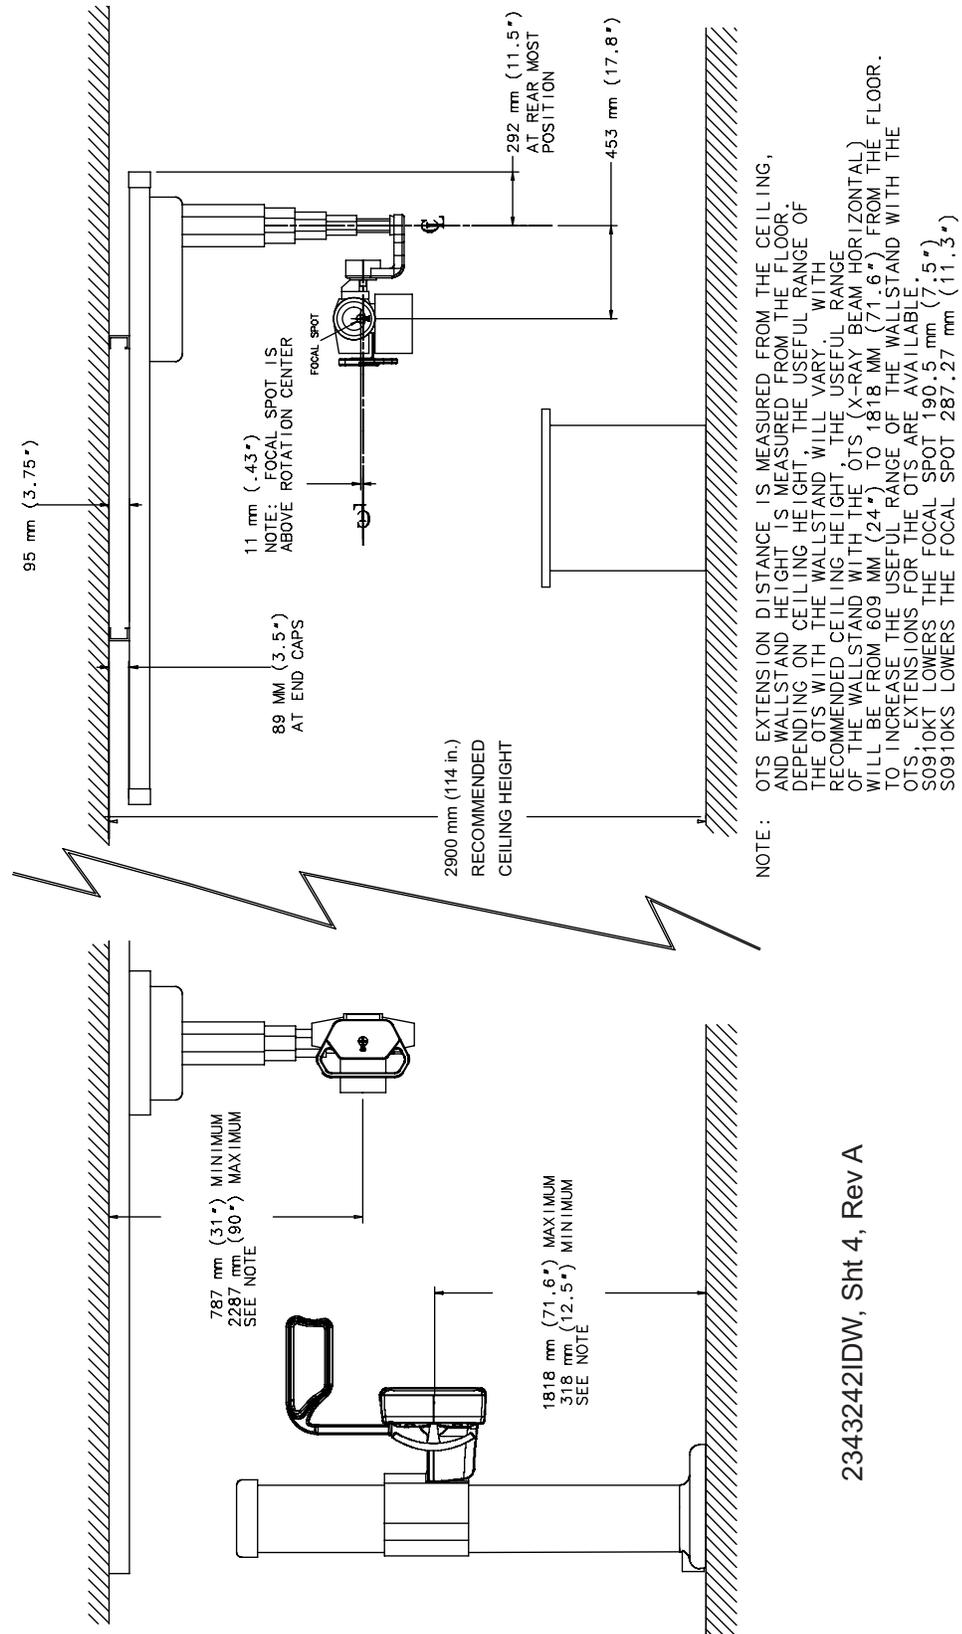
OTS Suspension Foot-End View and Wall Stand/OTS Side View
